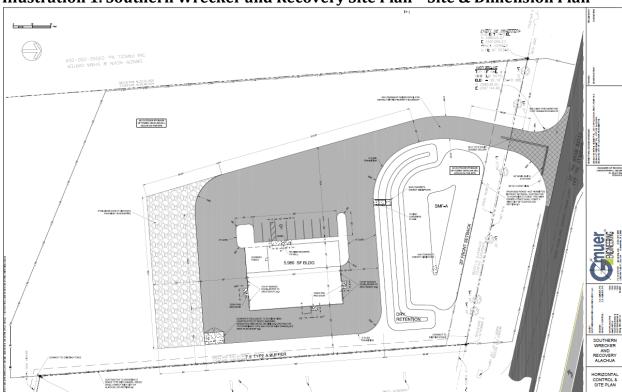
Southern Wrecker and Recovery Site Plan - Site & Dimension Plan
